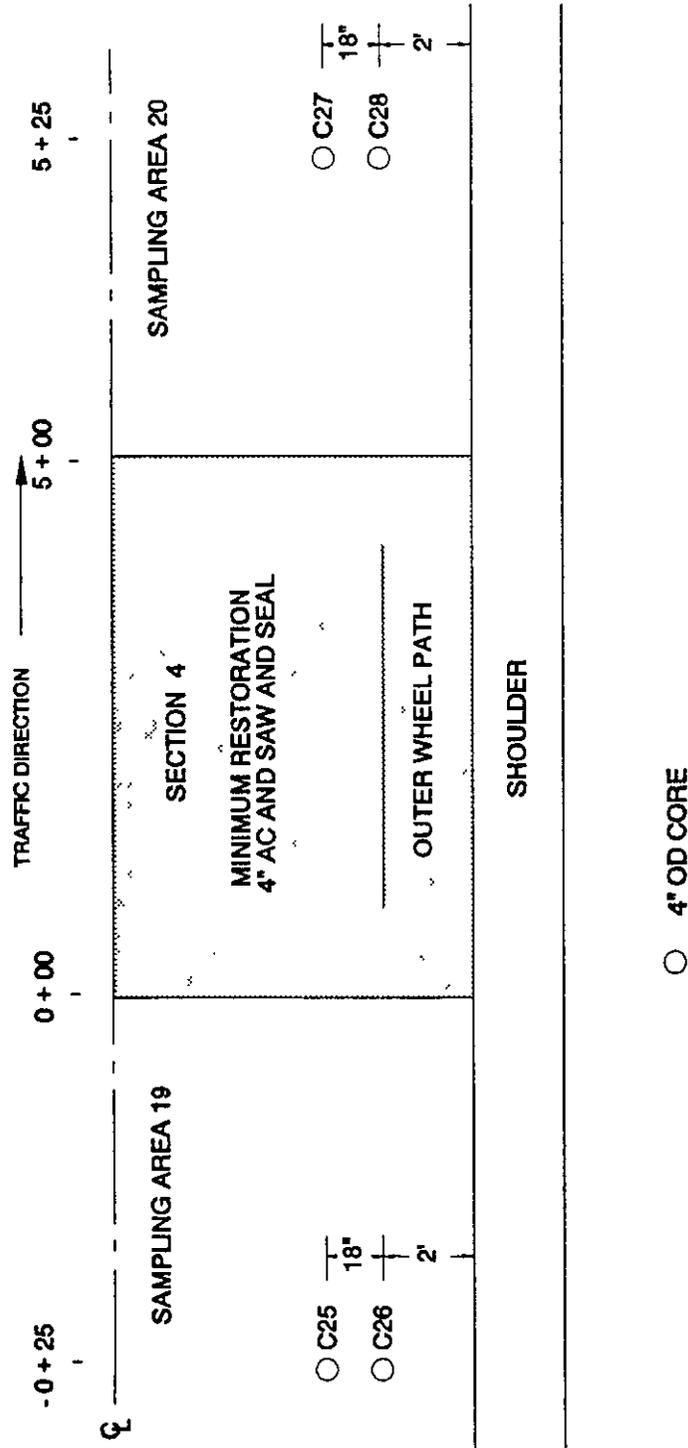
Example of "Post-Construction" Sampling Plan for Test Section 4
